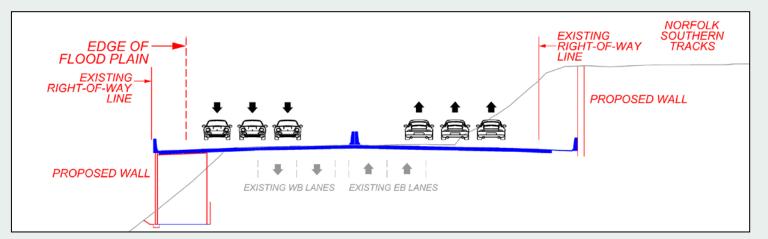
Proposed Roadway Cross Section Showing Floodplain Encroachment
